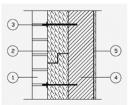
Cavity insulation scheme. 1 inside leaf of exterior wall, 2 PUR heat insulation, 3 wall fastener, 4 outside leaf of exterior wall, 5 interior plaster.
